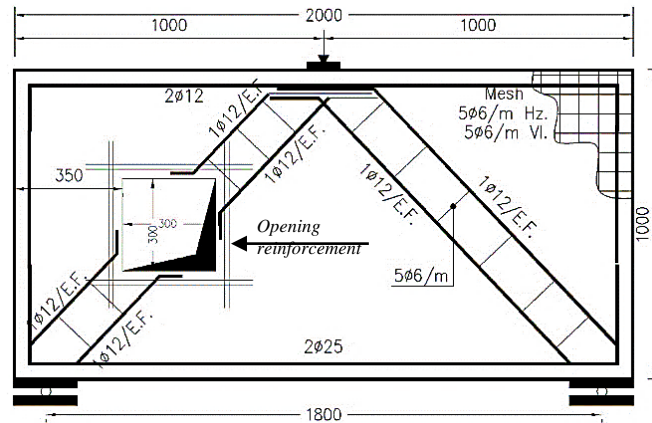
Geometry and reinforcement details of the deep beams in Group F
